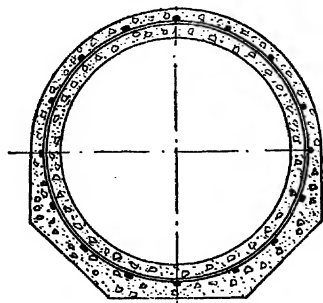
Cross-section of Reinforced Concrete Pipe.
